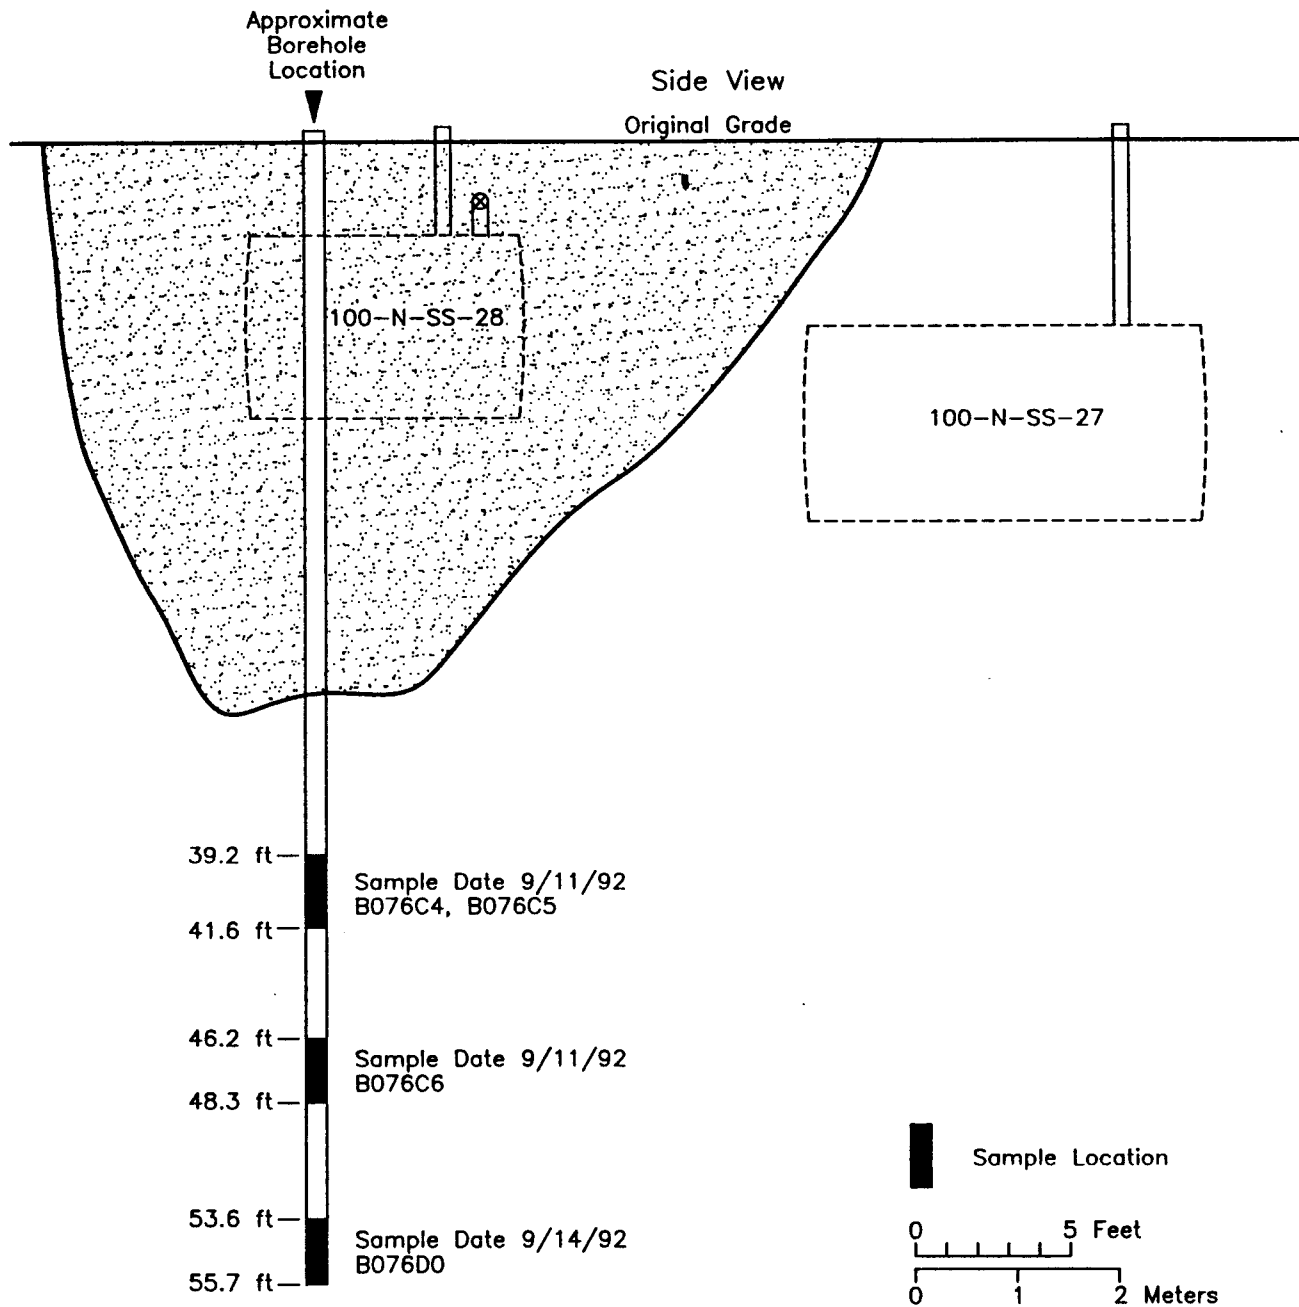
Soil Excavation and Sample Collection at Tank 100-N-SS-28 (10.9 cm [36 ft] Below Grade Surface).
